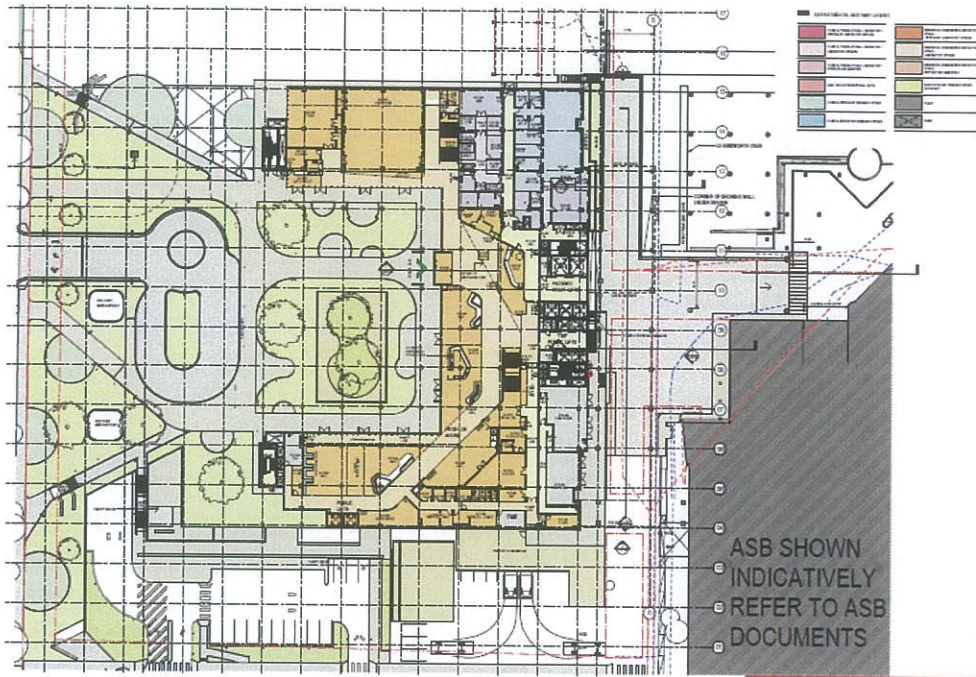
Proposed IASB showing lowering of Hospital Road (Source: BVN, 2019)
